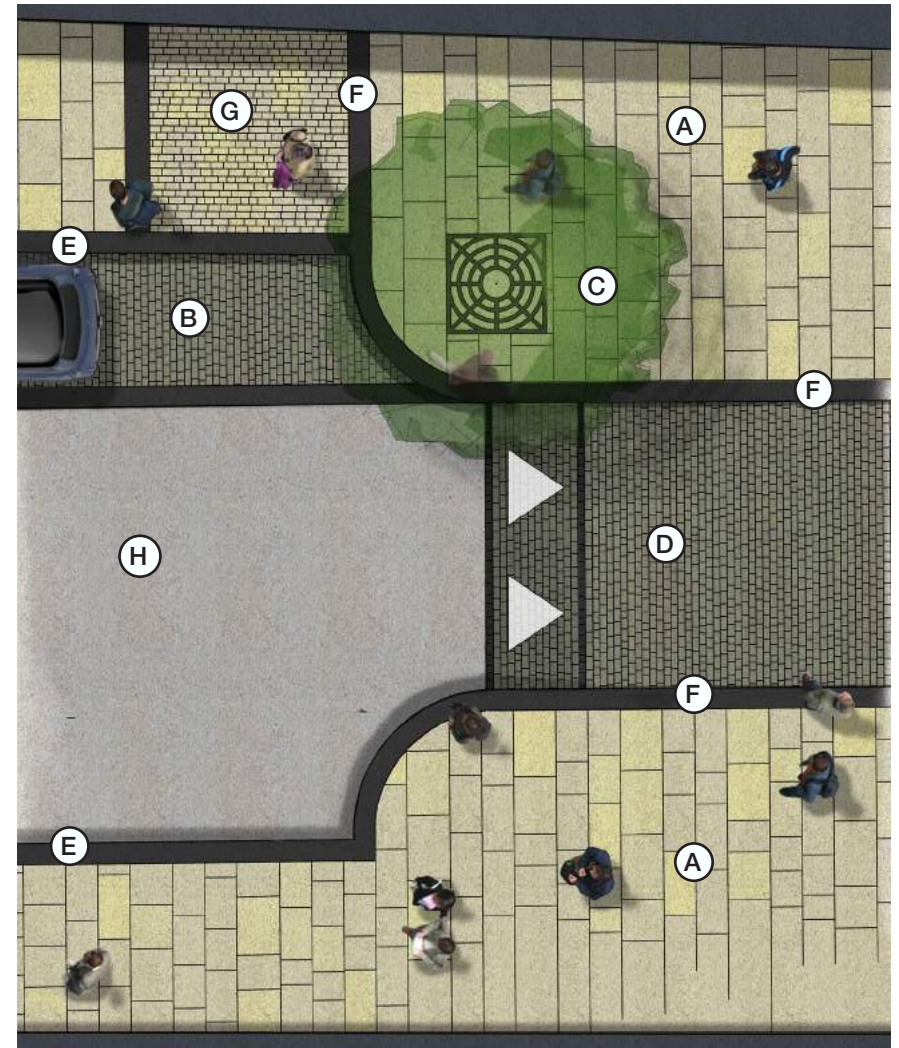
Concept sketch plan illustrating layout and materials of the street (Example Fore St.)
